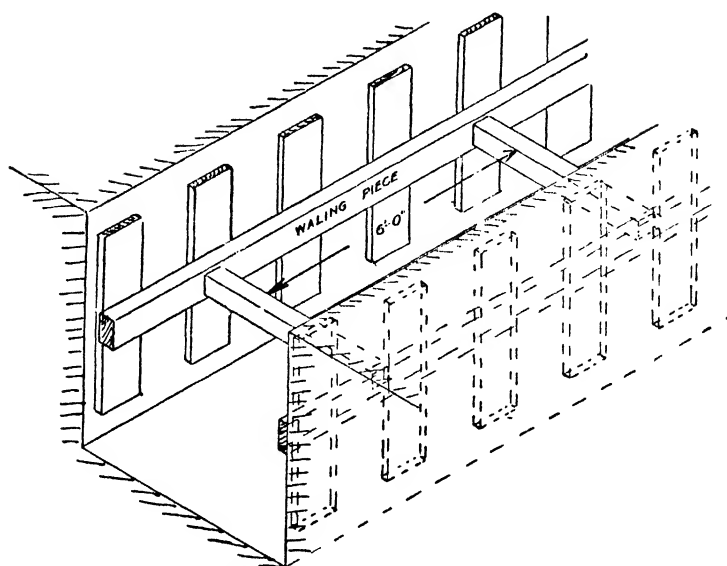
Timbering for Trenches in Doubtful Ground.
